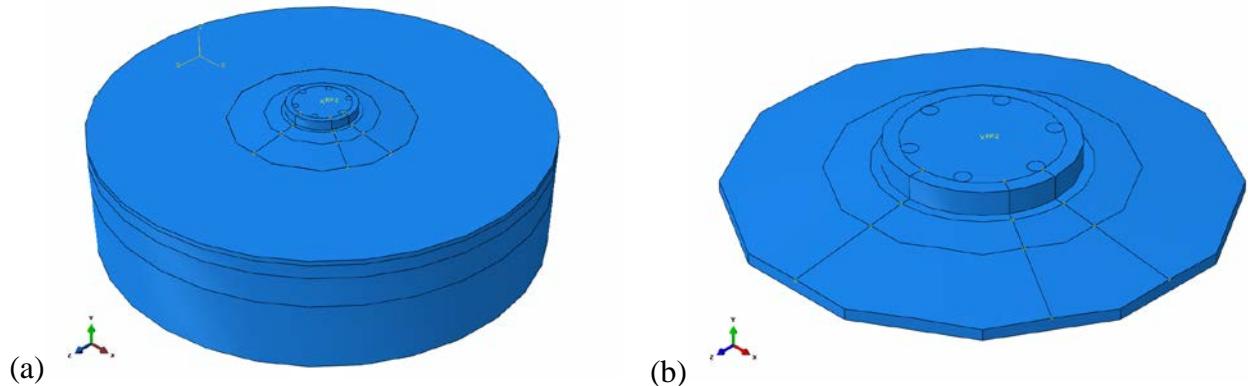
3-D FE model: (a) foundation-soil and (b) foundation
